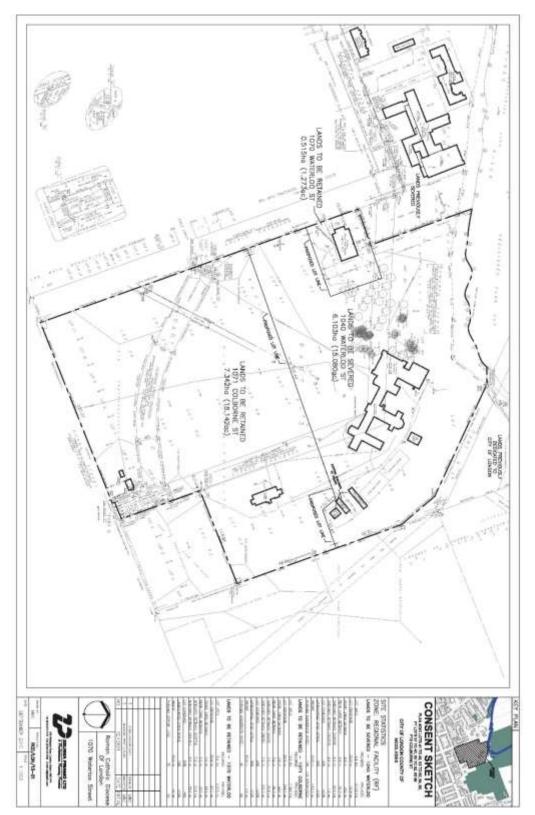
Consent sketch (B.034-16) showing lands to be severed (1040 Waterloo Street, St. Peter's Seminary building), lands to be retained (1071 Colborne Street, including Aquinas House; and 1070 Waterloo Street, Diocesan Centre building).
